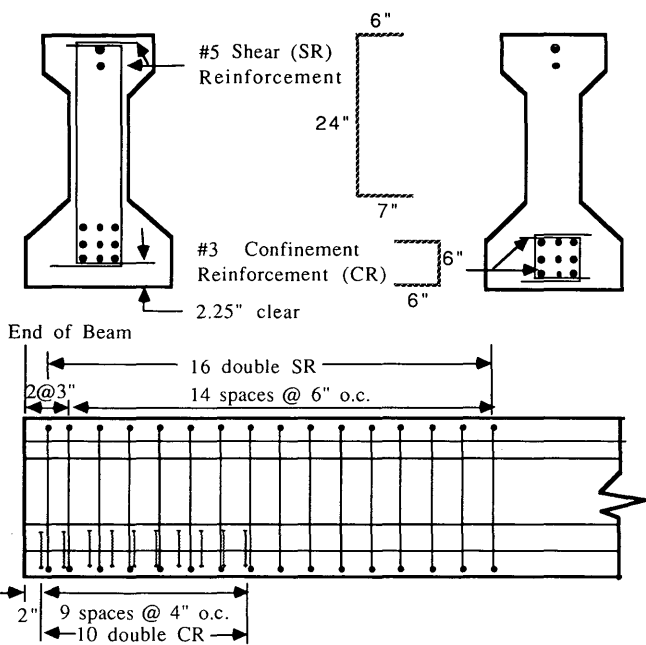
Shear and confinement reinforcement in each end of beam.
